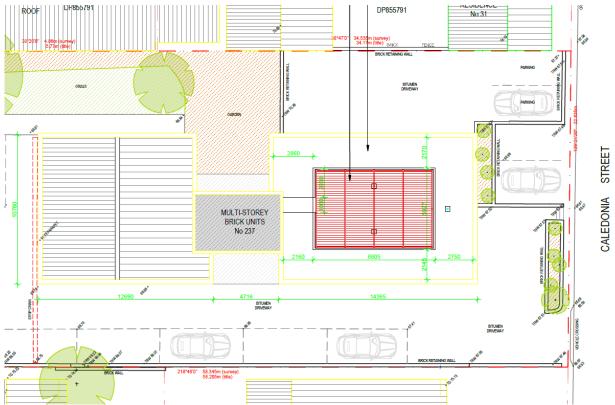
Roof plan demonstrating the location of proposed work and the setbacks (Source: Studiobad)
